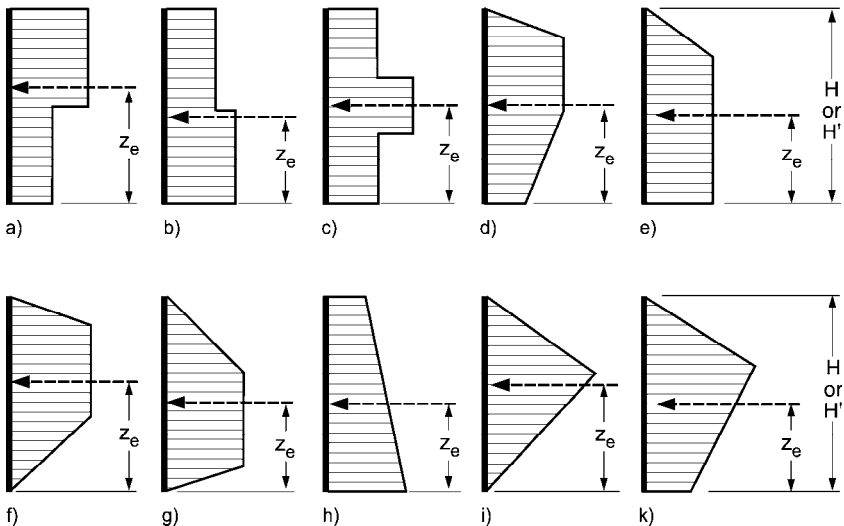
Pressure diagrams for supported retaining walls (examples)
